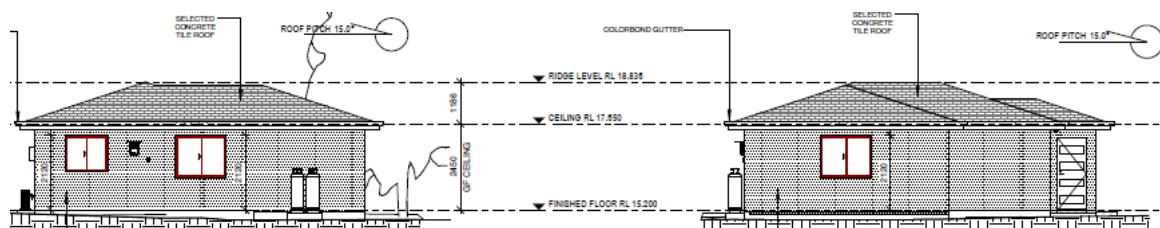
Western (rear) and Southern (side) elevation (source - RESCON Builders)
